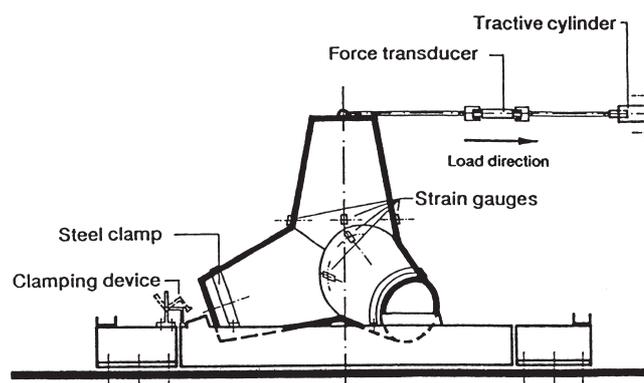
Set-up for static tests with tetrapods of 250 kg and 1.8 t.
